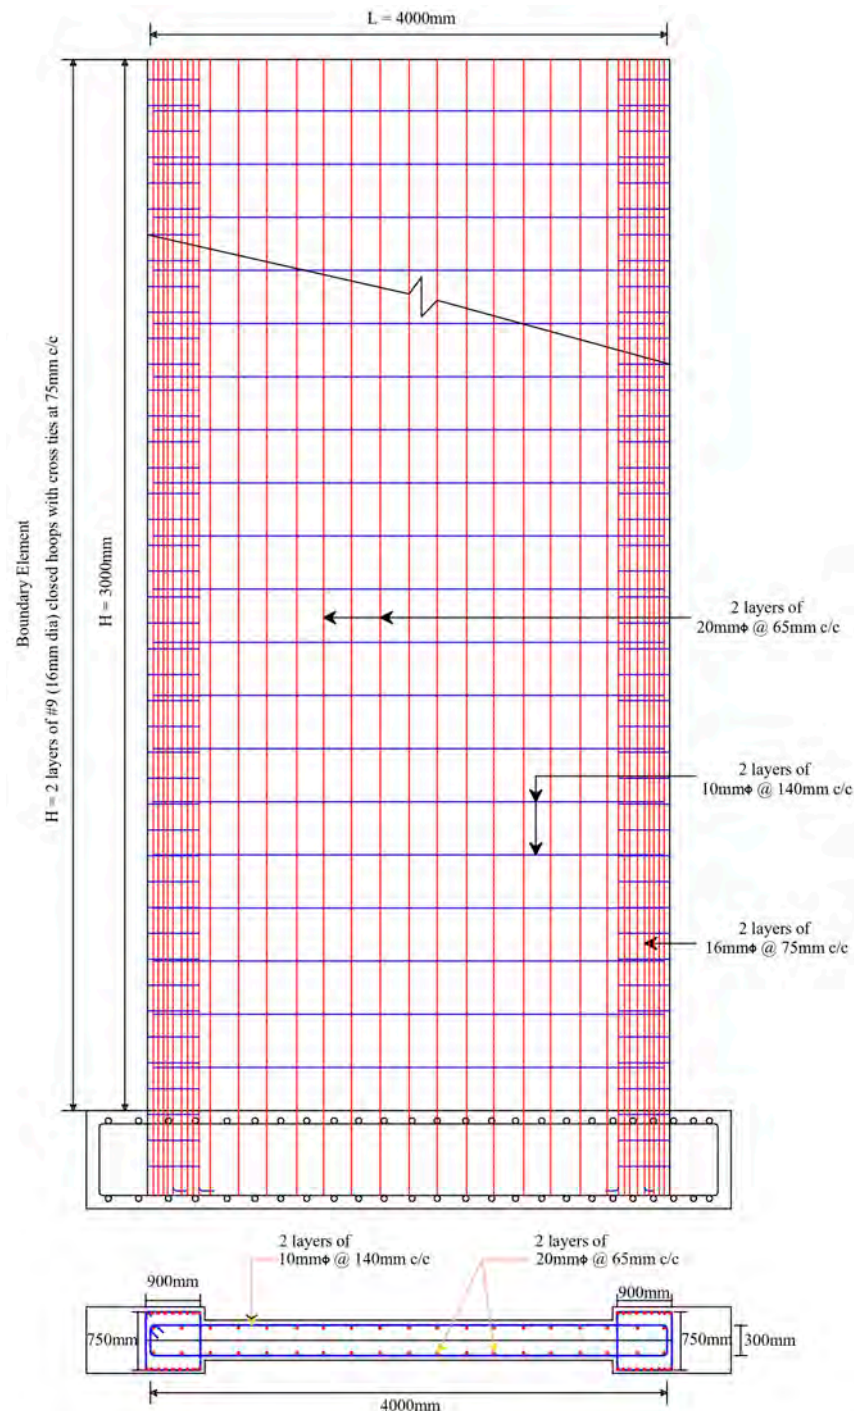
Reinforcement detailing of the 300 mm thick shear wall subjected to R3 blast cases (square-shaped building).
